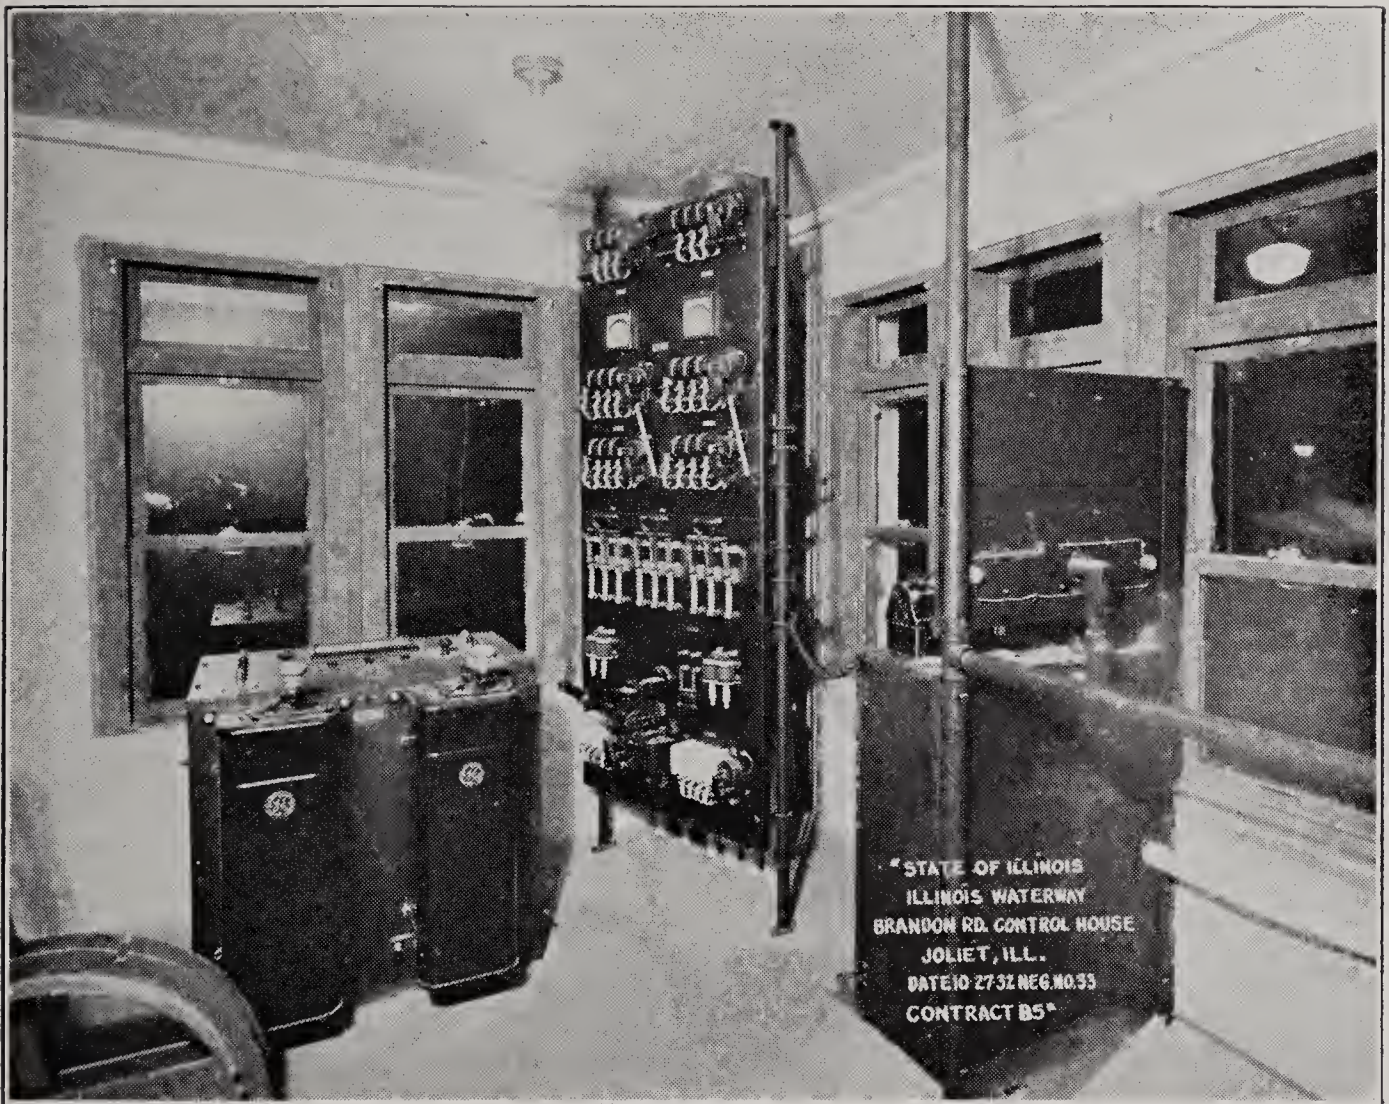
Brandon Road Bridge; Interior of Operator's House, showing control bench and switchboard.
